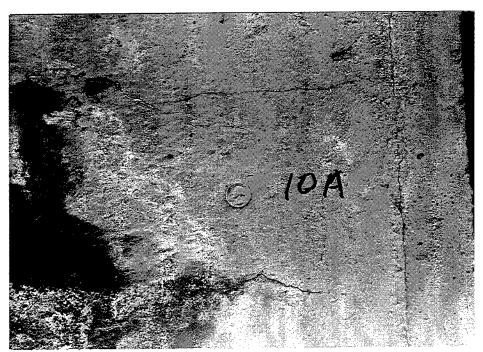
Cracks in experimental repair Slab 10A in Arizona
